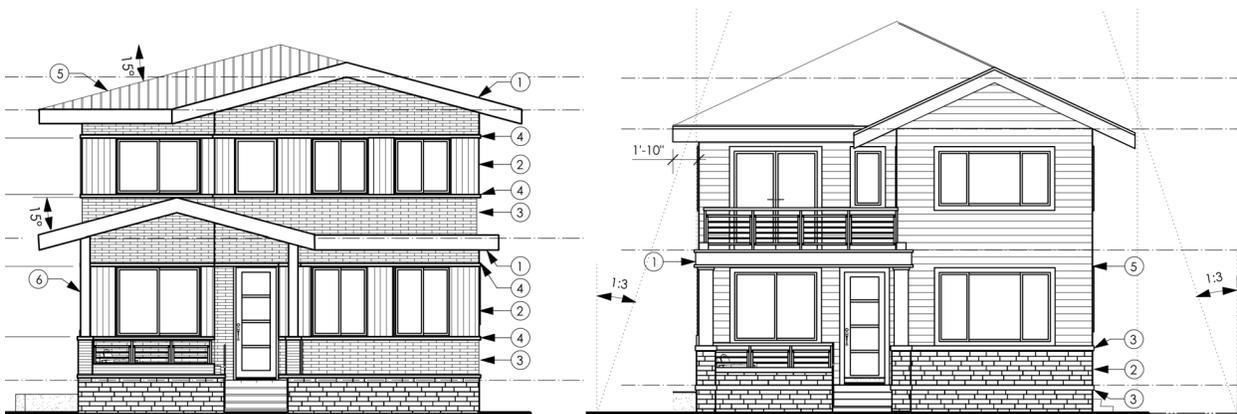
Original Front Elevation Proposal (Left), Final Revised Front Elevation Proposal, dated Oct. 14 (Right)
